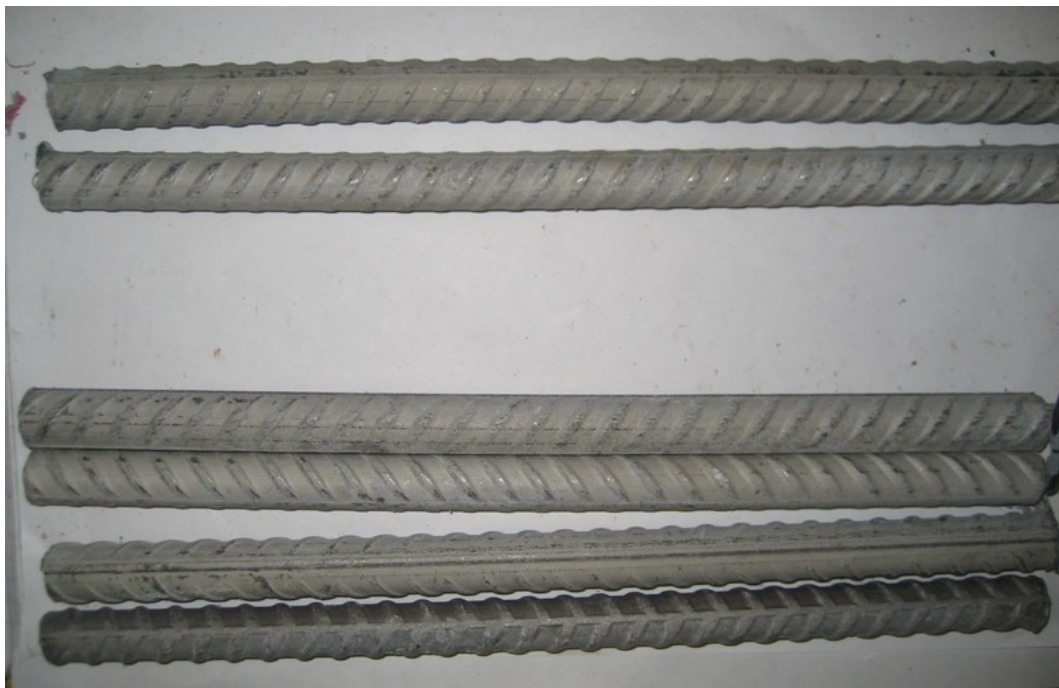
Bars from Southern Exposure specimen 5 containing undamaged stainless steel clad reinforcement after autopsy
